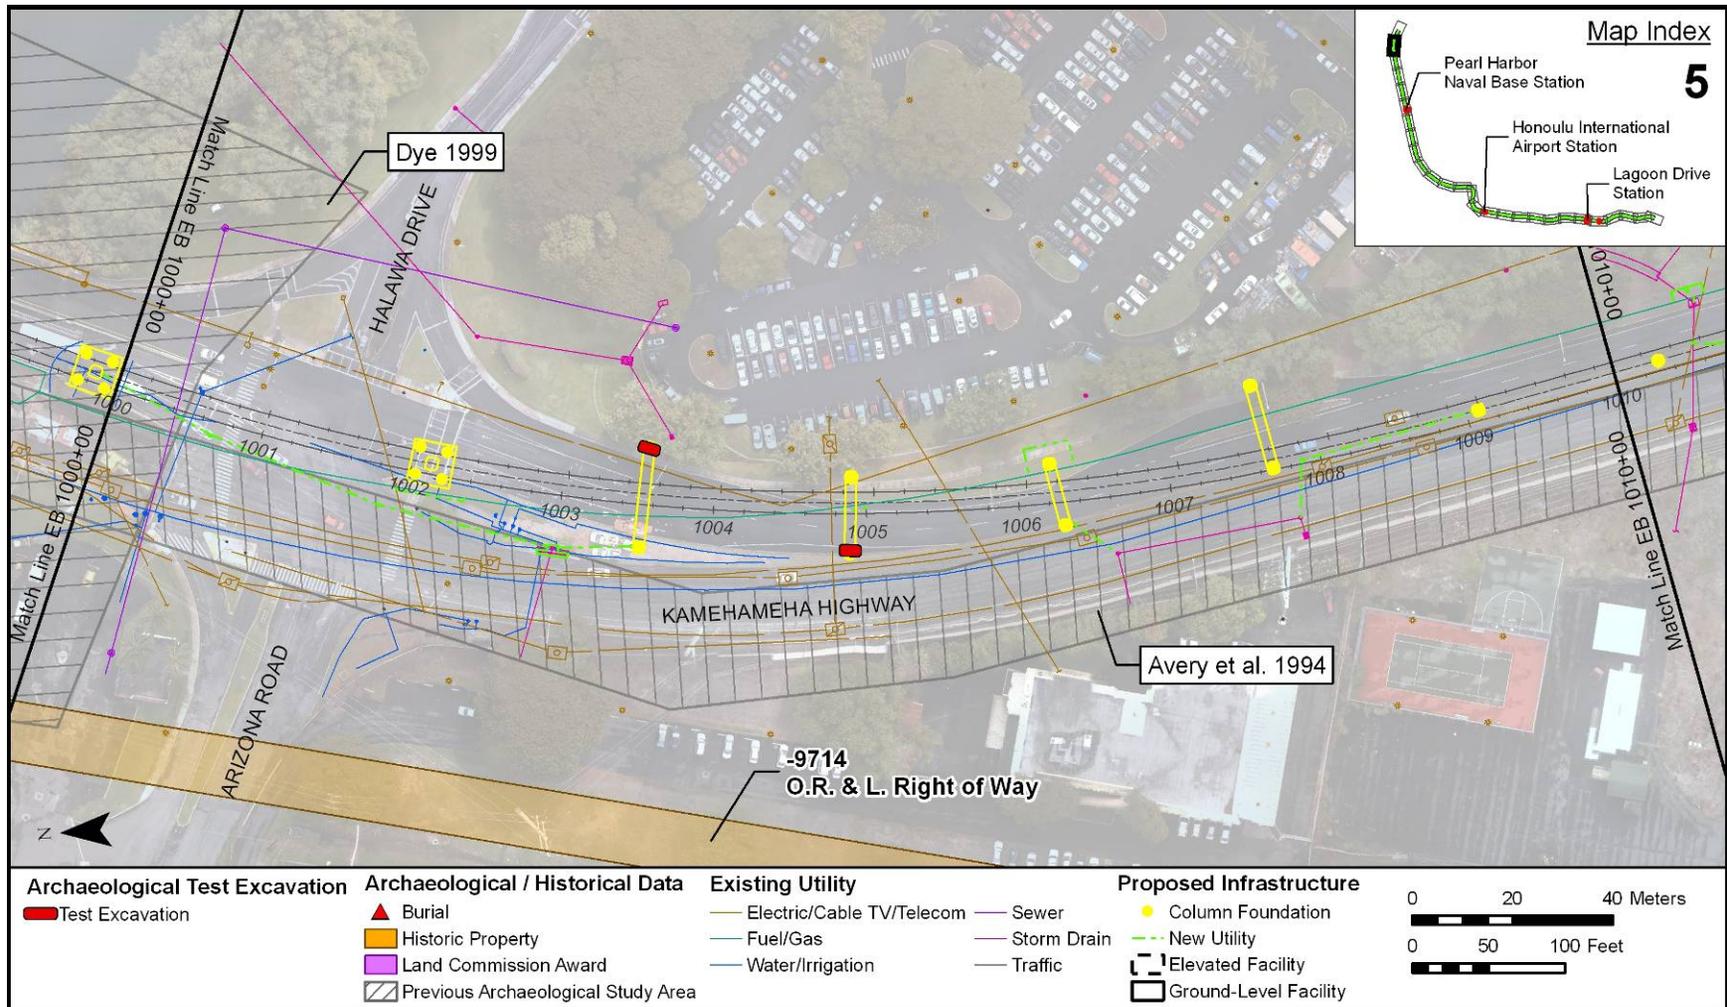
Map Sheet J 5 (near Hālawa Drive), two 10x3 excavations at column foundations @ 1003+60 mauka of two & 1004+90
